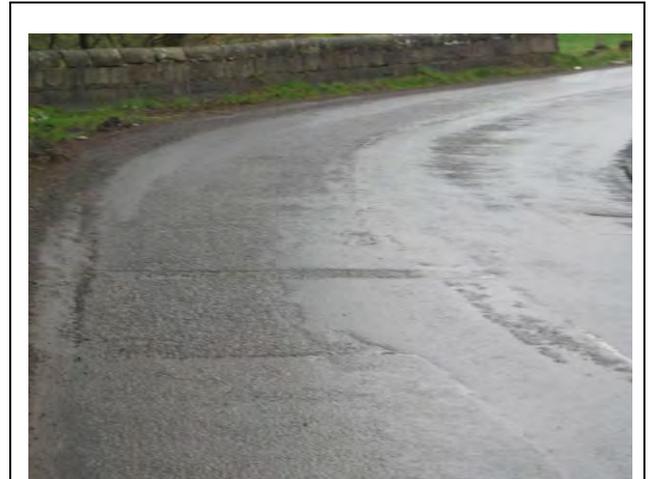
Carriageway Widening on Left Side Approach to Masonry Arch Bridge.
